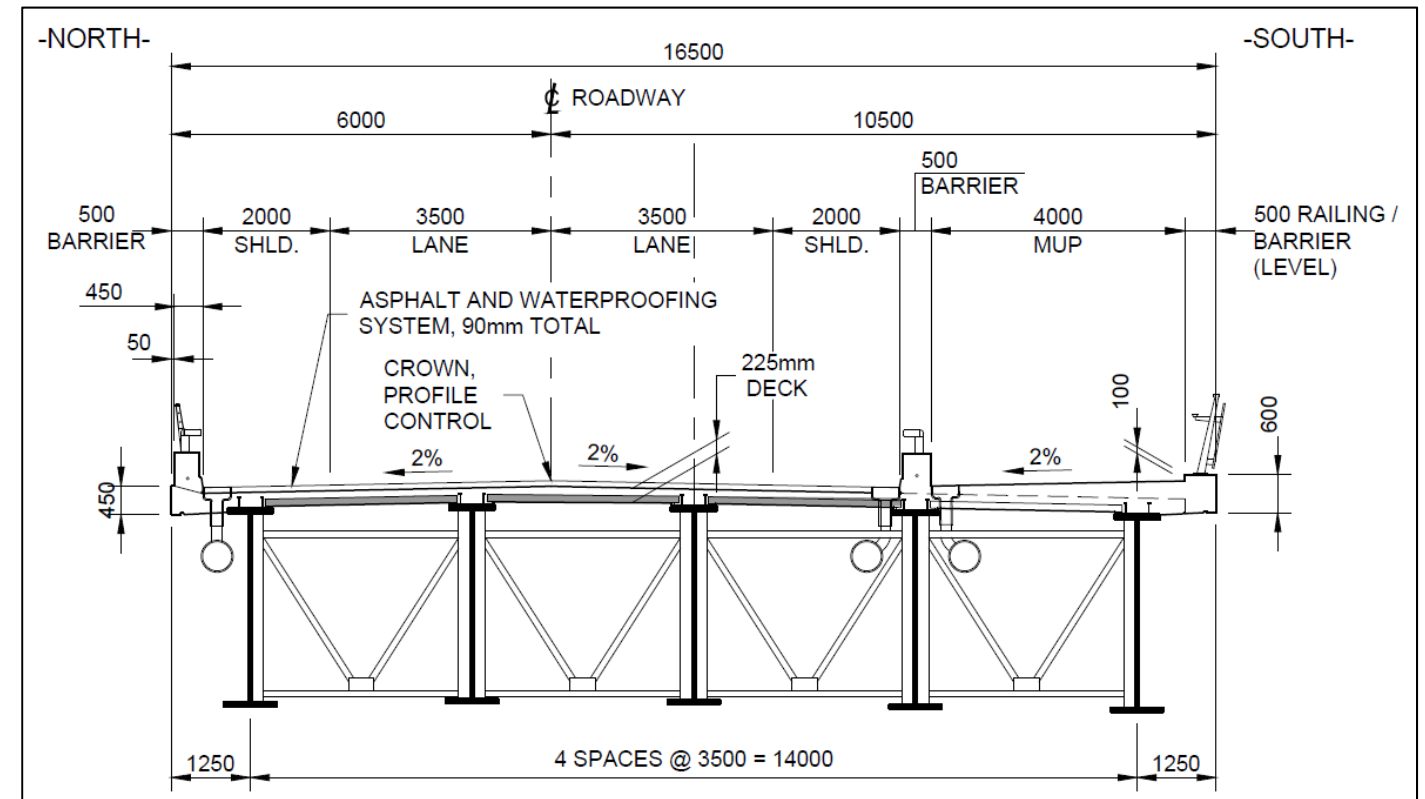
Cross-Section with Five Plate Girders
